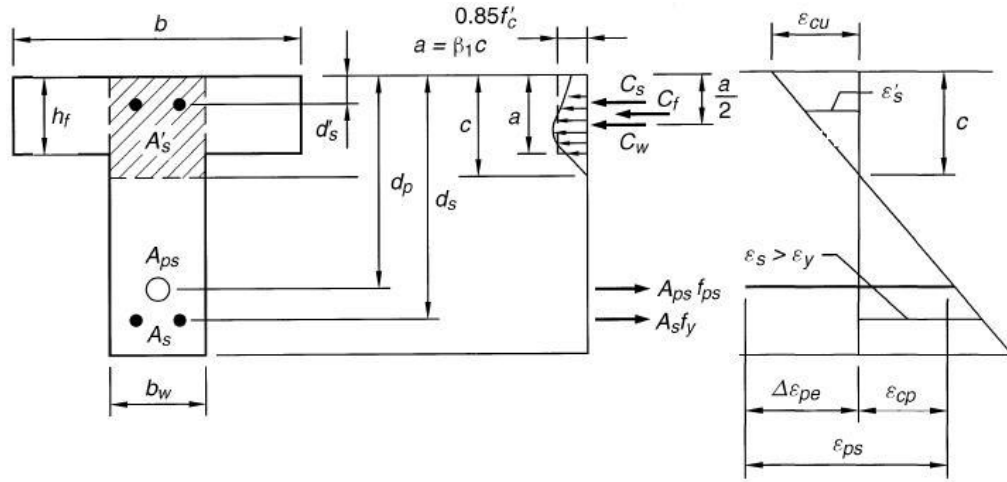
Forces on Reinforced Concrete Beam [4]
